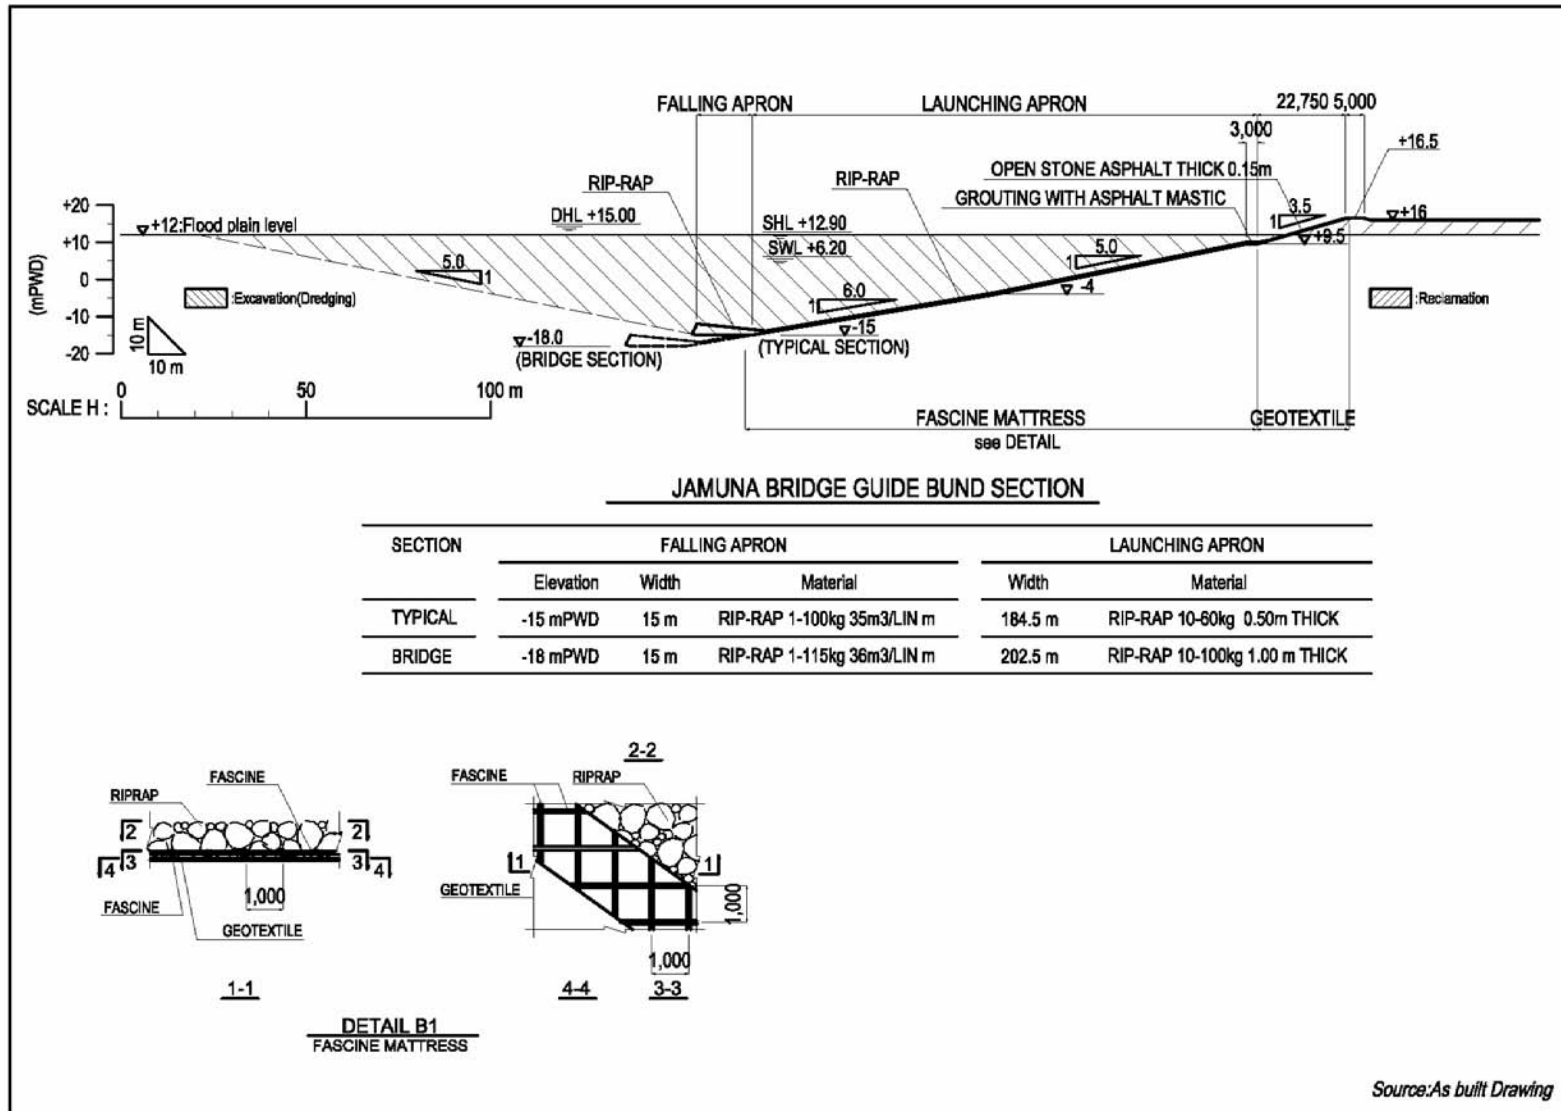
Guide Bund Section of Jamuna Bridge
